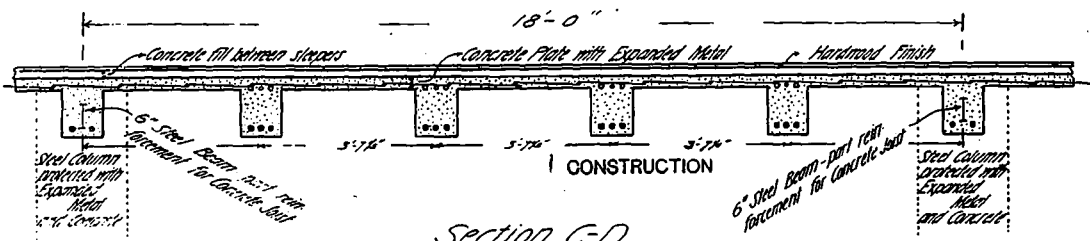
DIAGRAM OF CROSS SECTION OF TYPICAL BAY, OGILVIE BUILDING, TORONTO, GIVING SECTIONAL END VIEW OF EACH OF THE SIX CONCRETE JOIST BEAMS THAT DIVIDE EACH BAY INTO FIVE PANELS. THIS DIAGRAM ALSO SHOWS THE SMALL TIE BEAMS WHICH RUN IN OPPOSITE DIRECTION TO THE GIRDERS, AND TIE THE COLUMNS ONE TO THE OTHER, THUS MAKING A SECURE SKELETON FRAME TO SUPPORT THE CONCRETE FLOORS. THIS SECTION IS DESIGNATED AS C-D IN FIG. 16.
